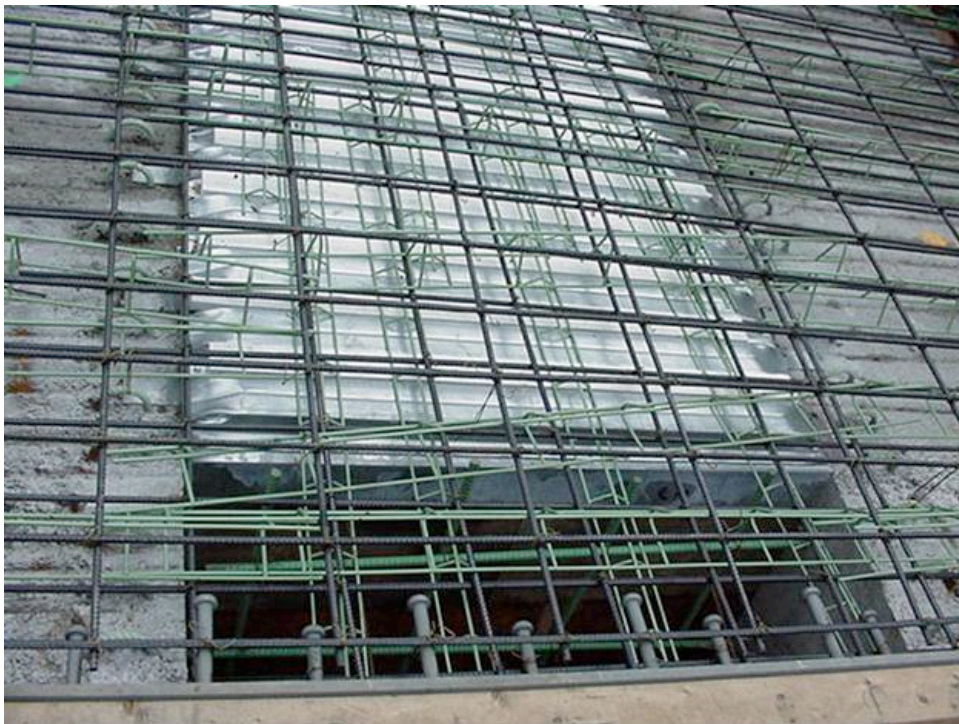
Longitudinal and transverse reinforcements are CFRP rebars in the Two Mile Creek bridge
